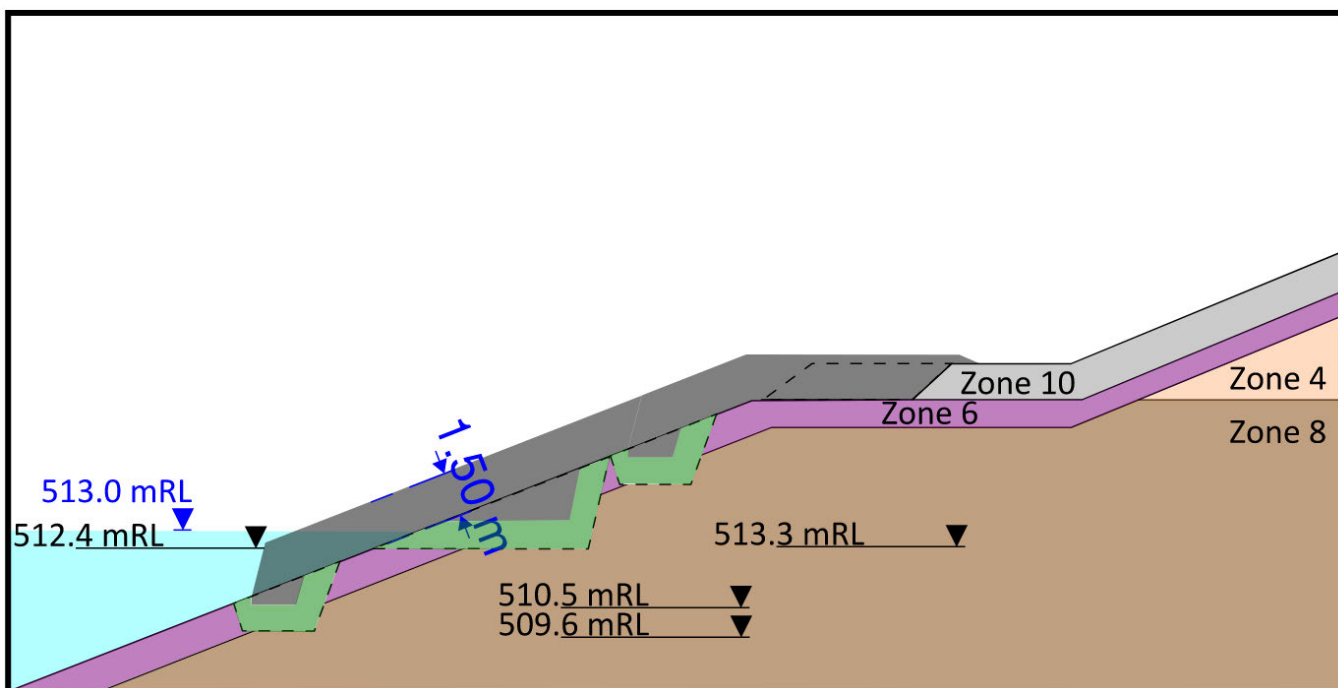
Schematic sketch – Tranche 2 – Main Dam – Placement of rip-rap and backfilling of construction bench – Not to Scale
